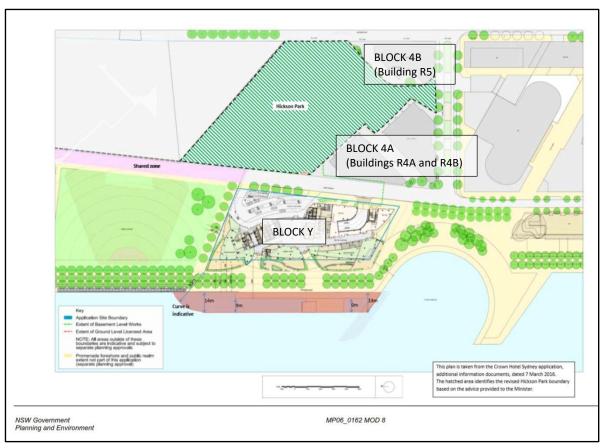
Barangaroo Concept Plan (MOD 8) – Appendix 1
